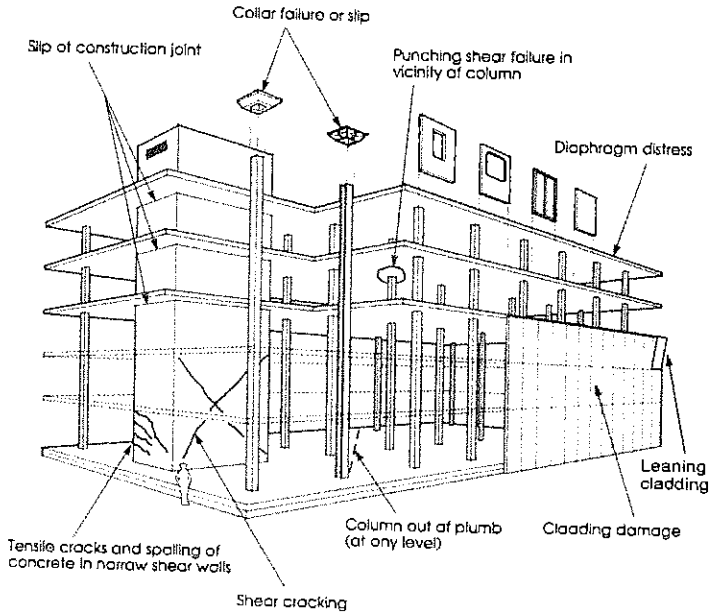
Inspection points for lift-slab construction. This figure can also be used for flat-slab structures.
